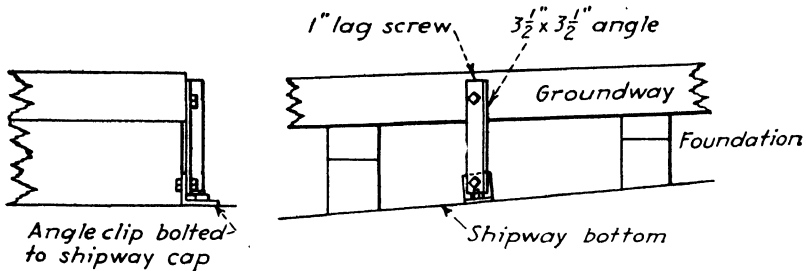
Method of securing ground ways in place in semi-submerged building shipway.
